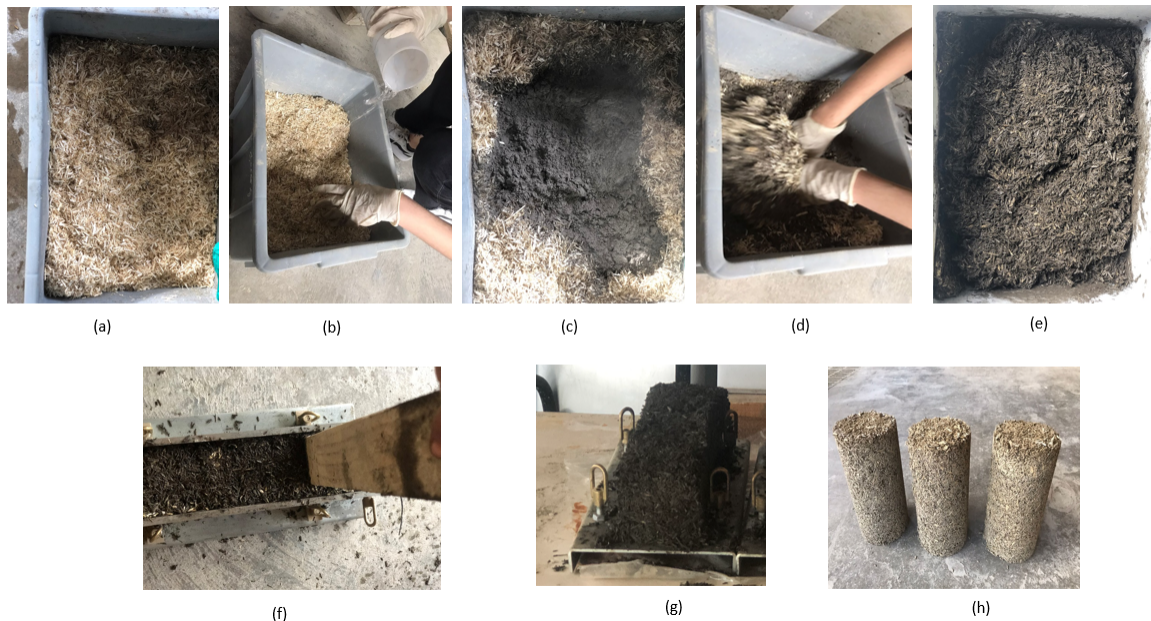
Process of hemp concrete design for bending specimens; (a): dropping of hemp shives, (b): wetting of hemp shives, (c): put on CSA cement, (d): hand mixing of hemp shives with water and cement, (e): status of the resulting mixture, (f): compaction loads on hemp concrete inside the molds, (g): demolded hemp concrete in the case of the parallelepiped molds, (h): demolded hemp concrete in the case of the cylindrical specimens.
